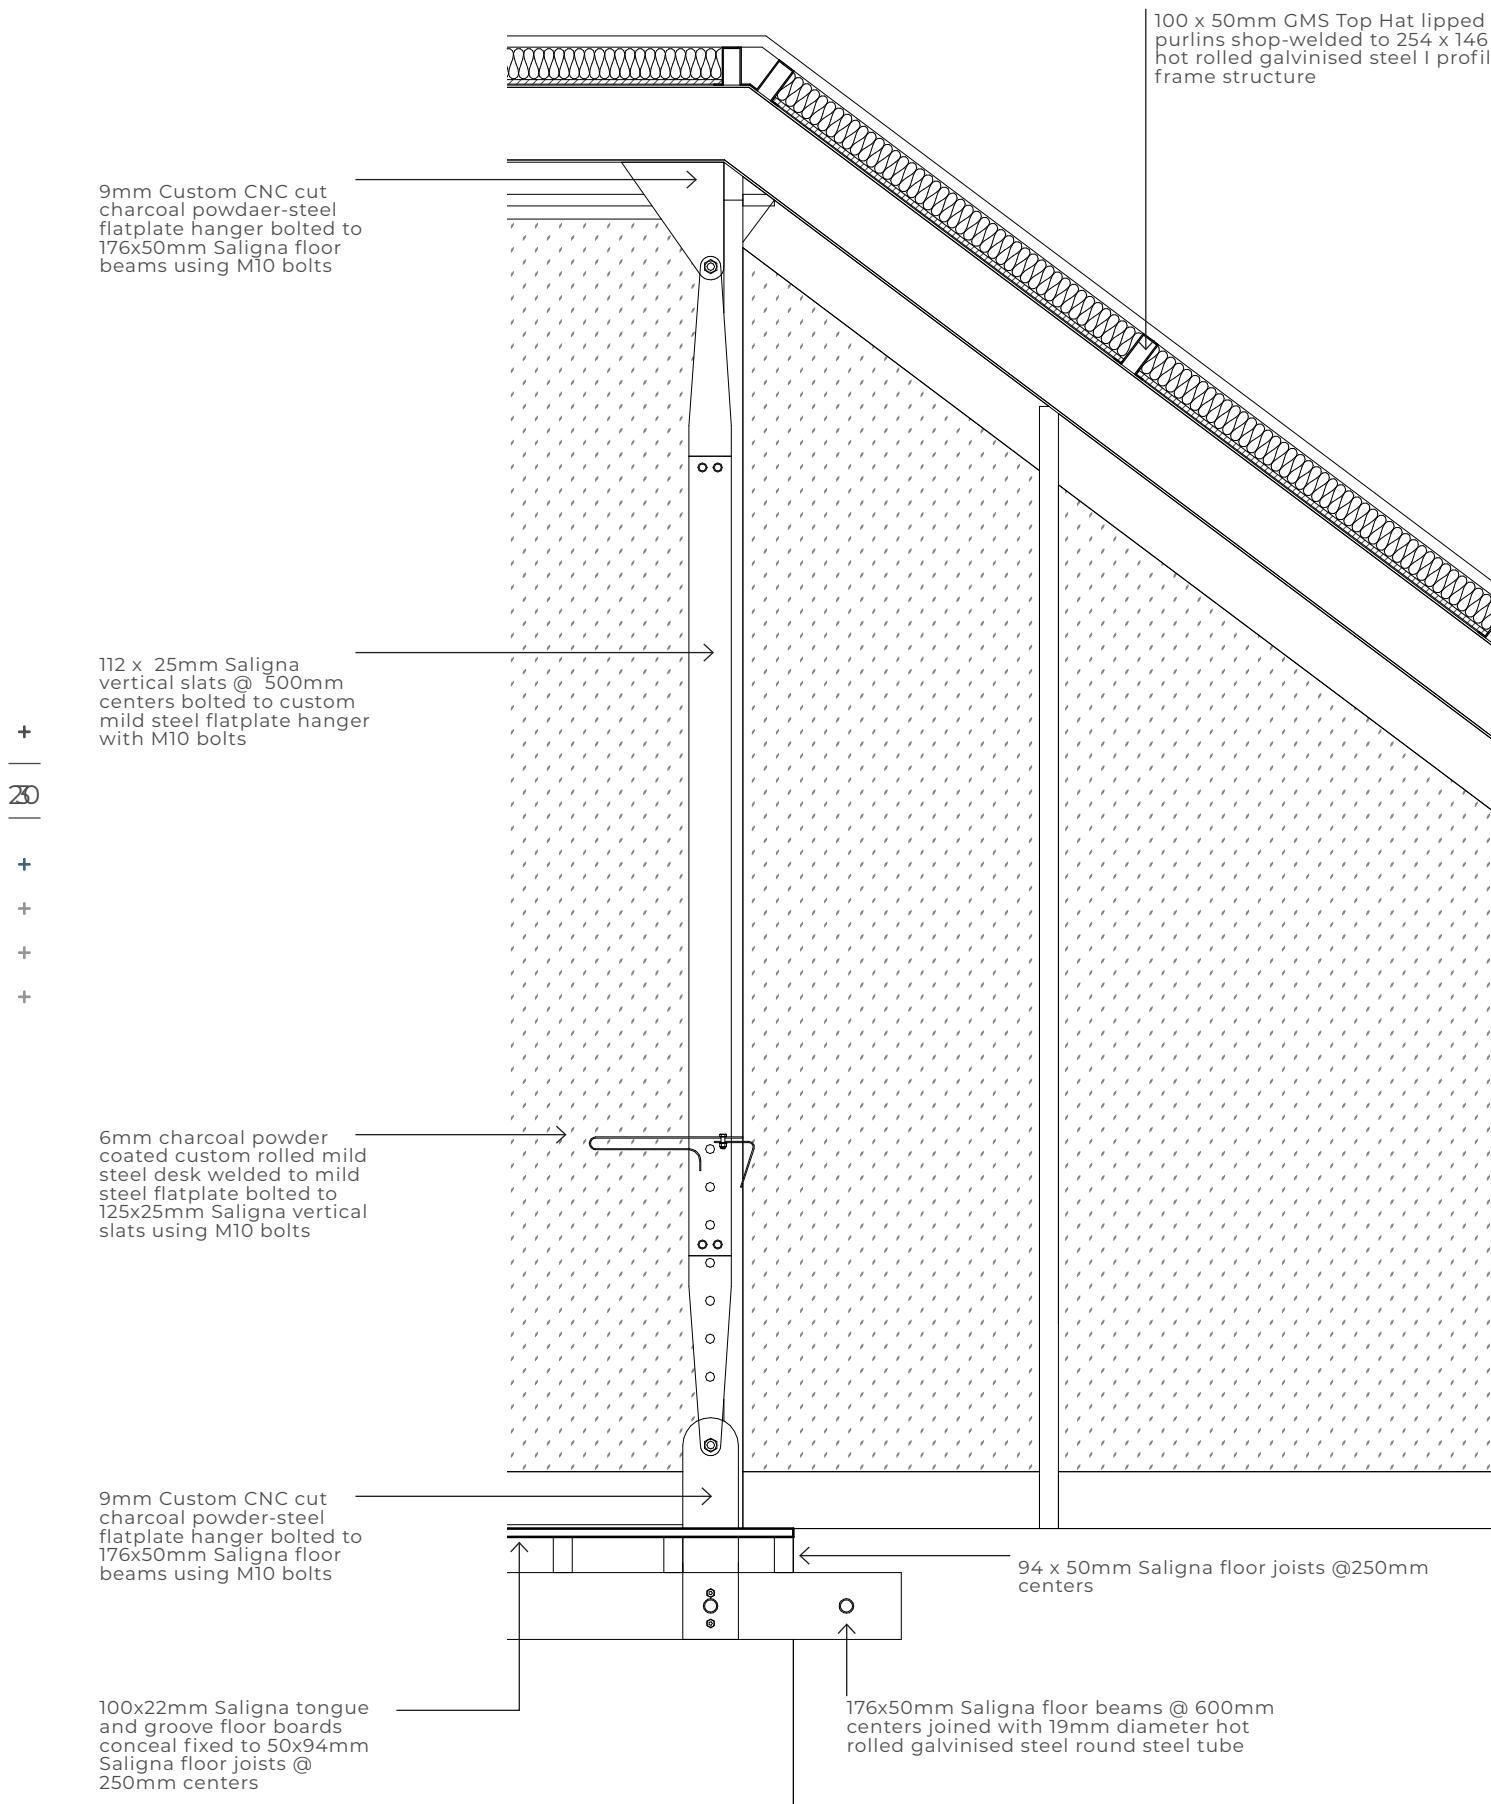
Detail of design space roof (Drawing at 1:20) (Original drawing at 1:10) (Author:2018)
